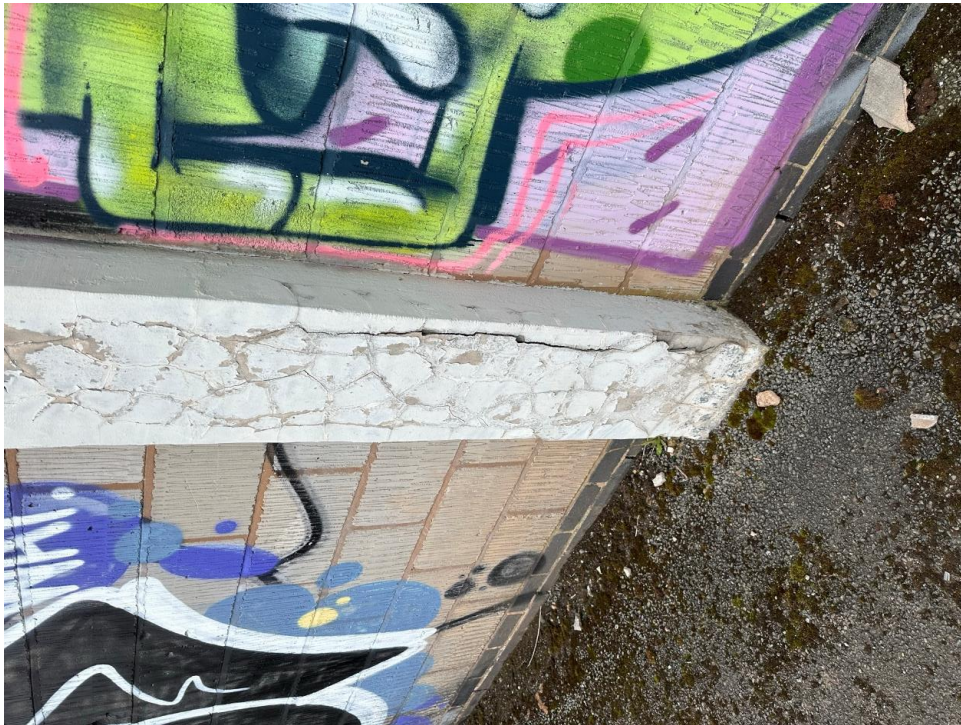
Main Grandstand western rear elevation cracking to column concrete
